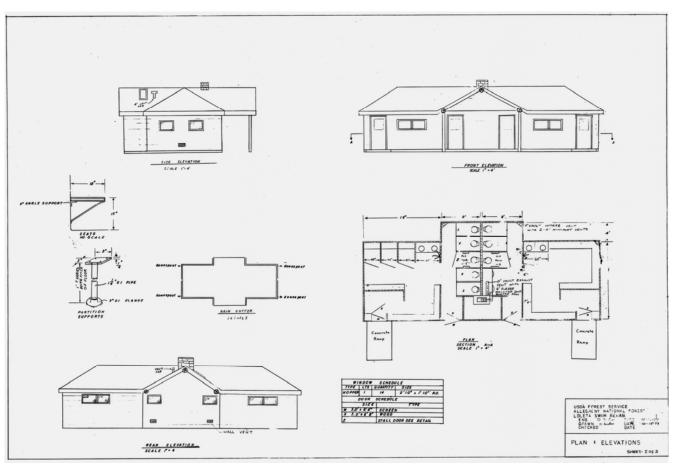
1979 plan and elevation for the bathhouse. From HABS PA 5963, online, http://www.loc.gov/pictures/item/pa2802.photos.357208p/, accessed April 1, 2015.
